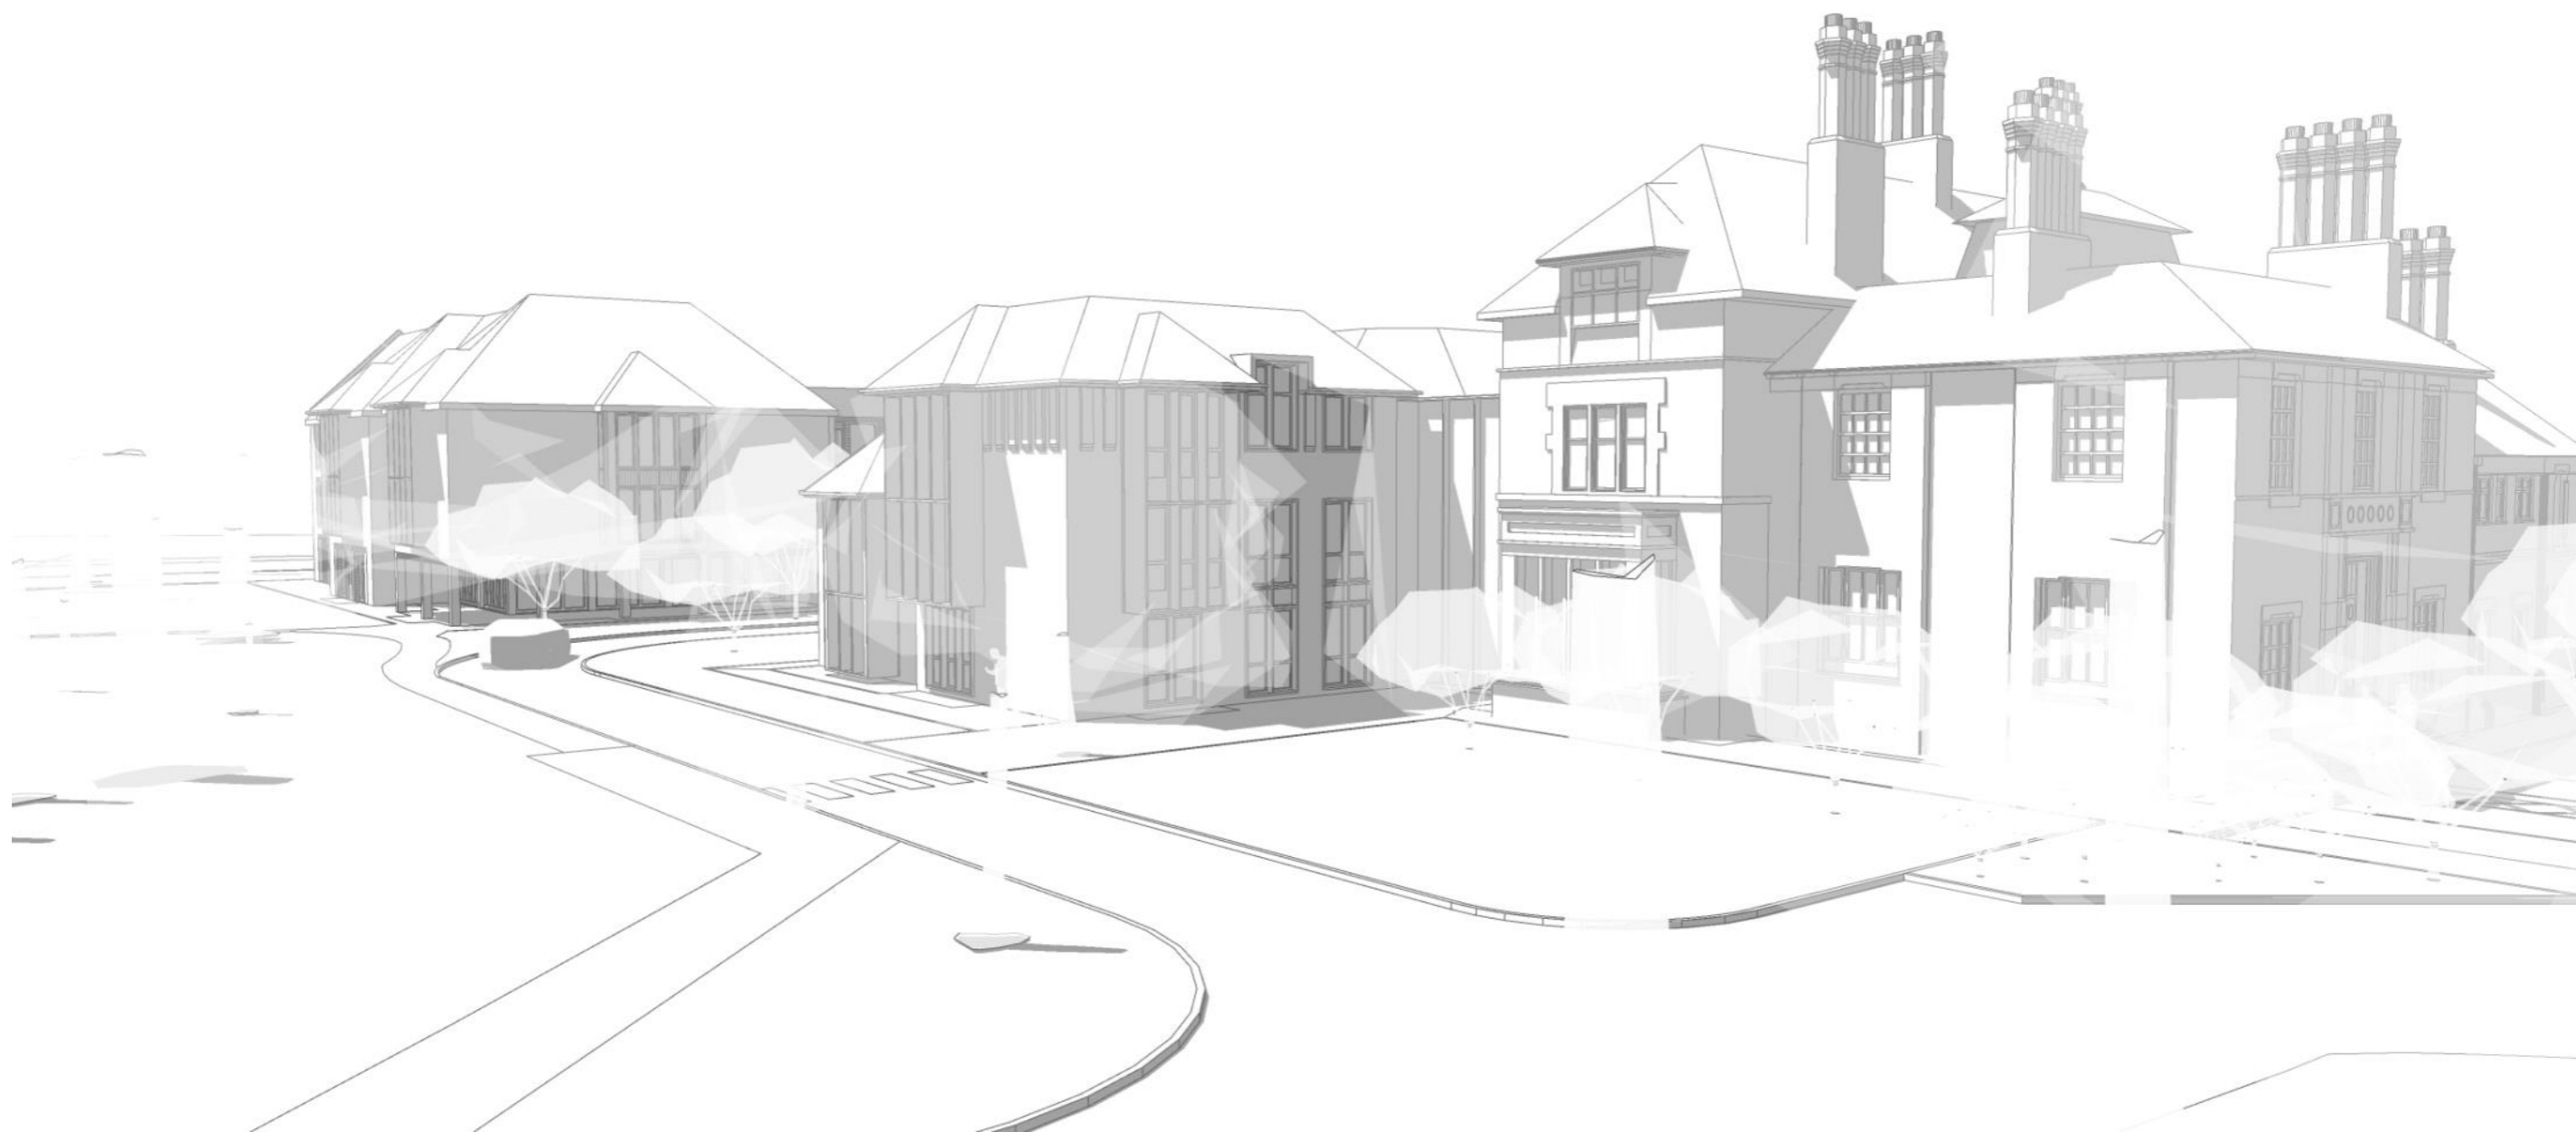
View from approach road showing Bushloe House with proposed rebuilt extension and new Care Home in background
